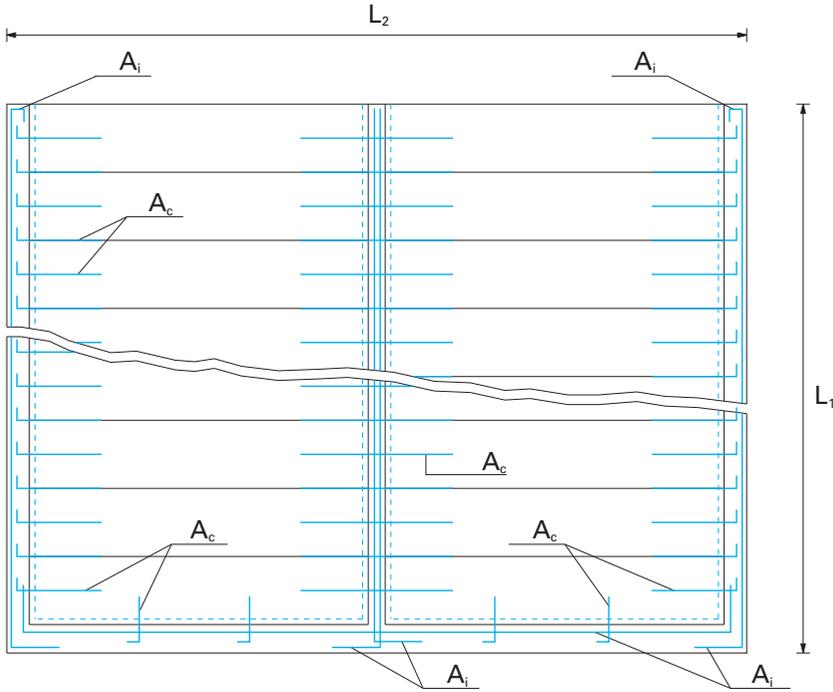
Connections and ties in a floor with hollow core slabs.
